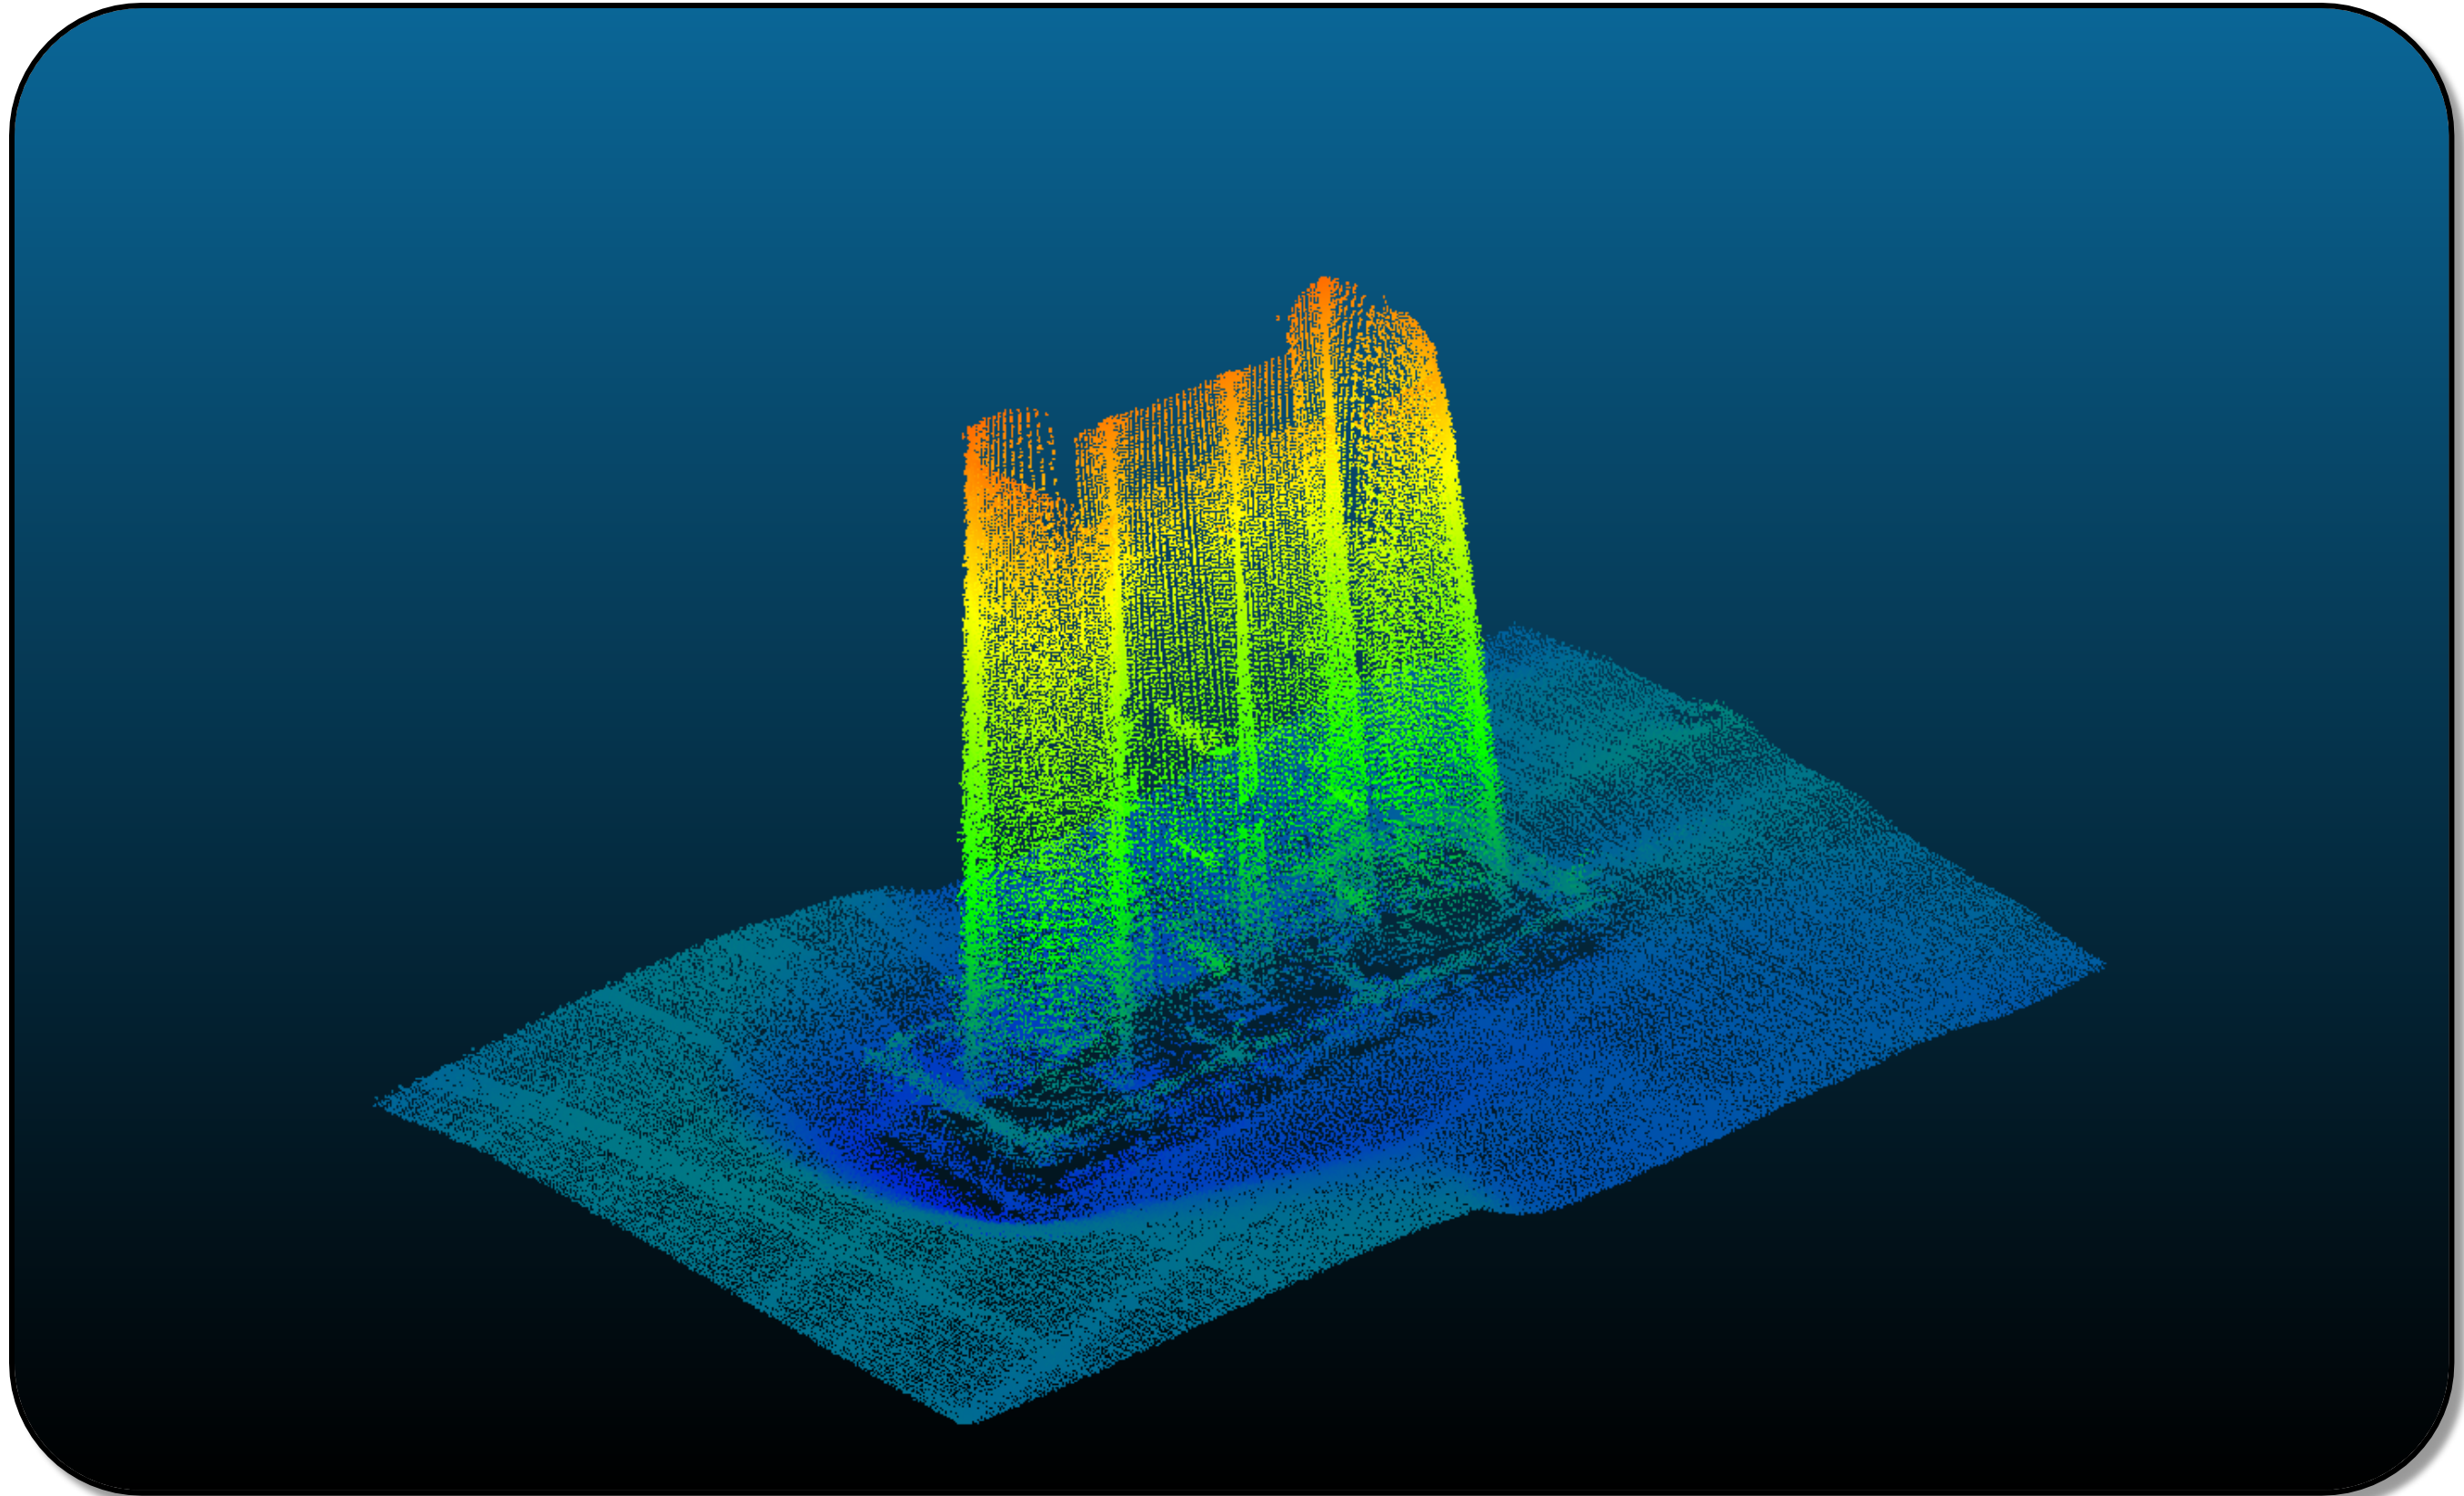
Perspective view of Pier 13 point cloud (looking from the northeast direction).
